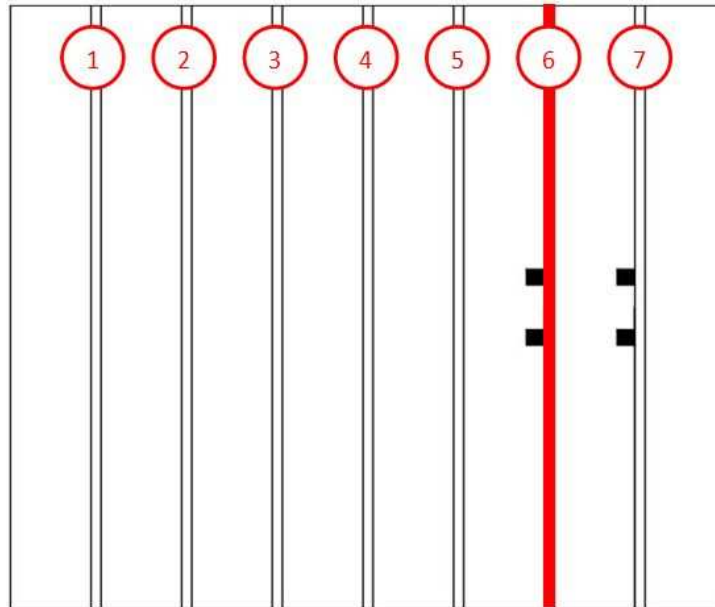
Critical load location for positive moment for a six-foot section NEXT-D bridge
